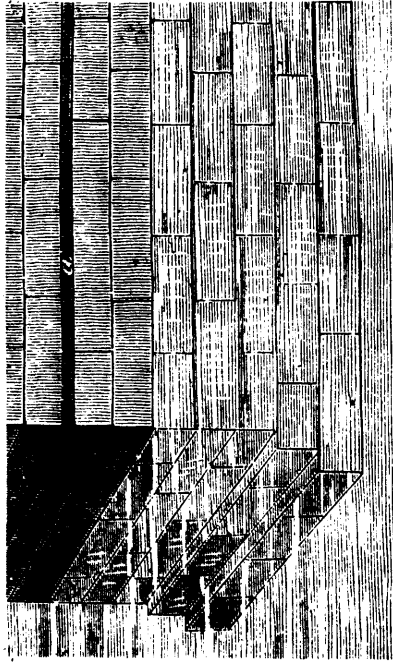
WALL CONSTRUCTED IN THE WATER.
